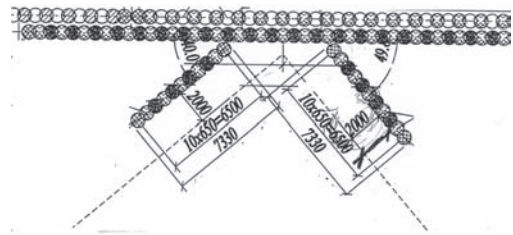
Overview plan of geotechnical cut-off diaphragm wall around a building (6, Tankovy Proezd).
